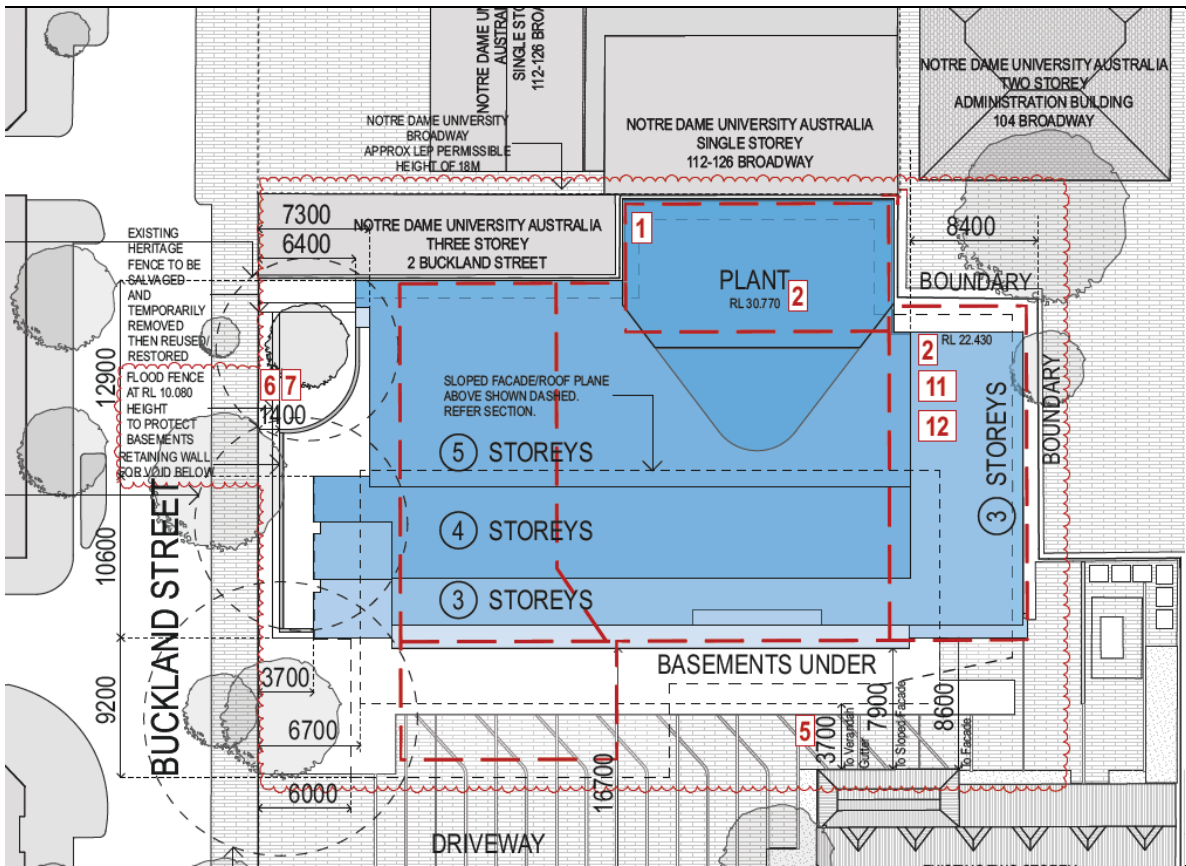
| Proposed building envelope plan (with approved envelope in red)
